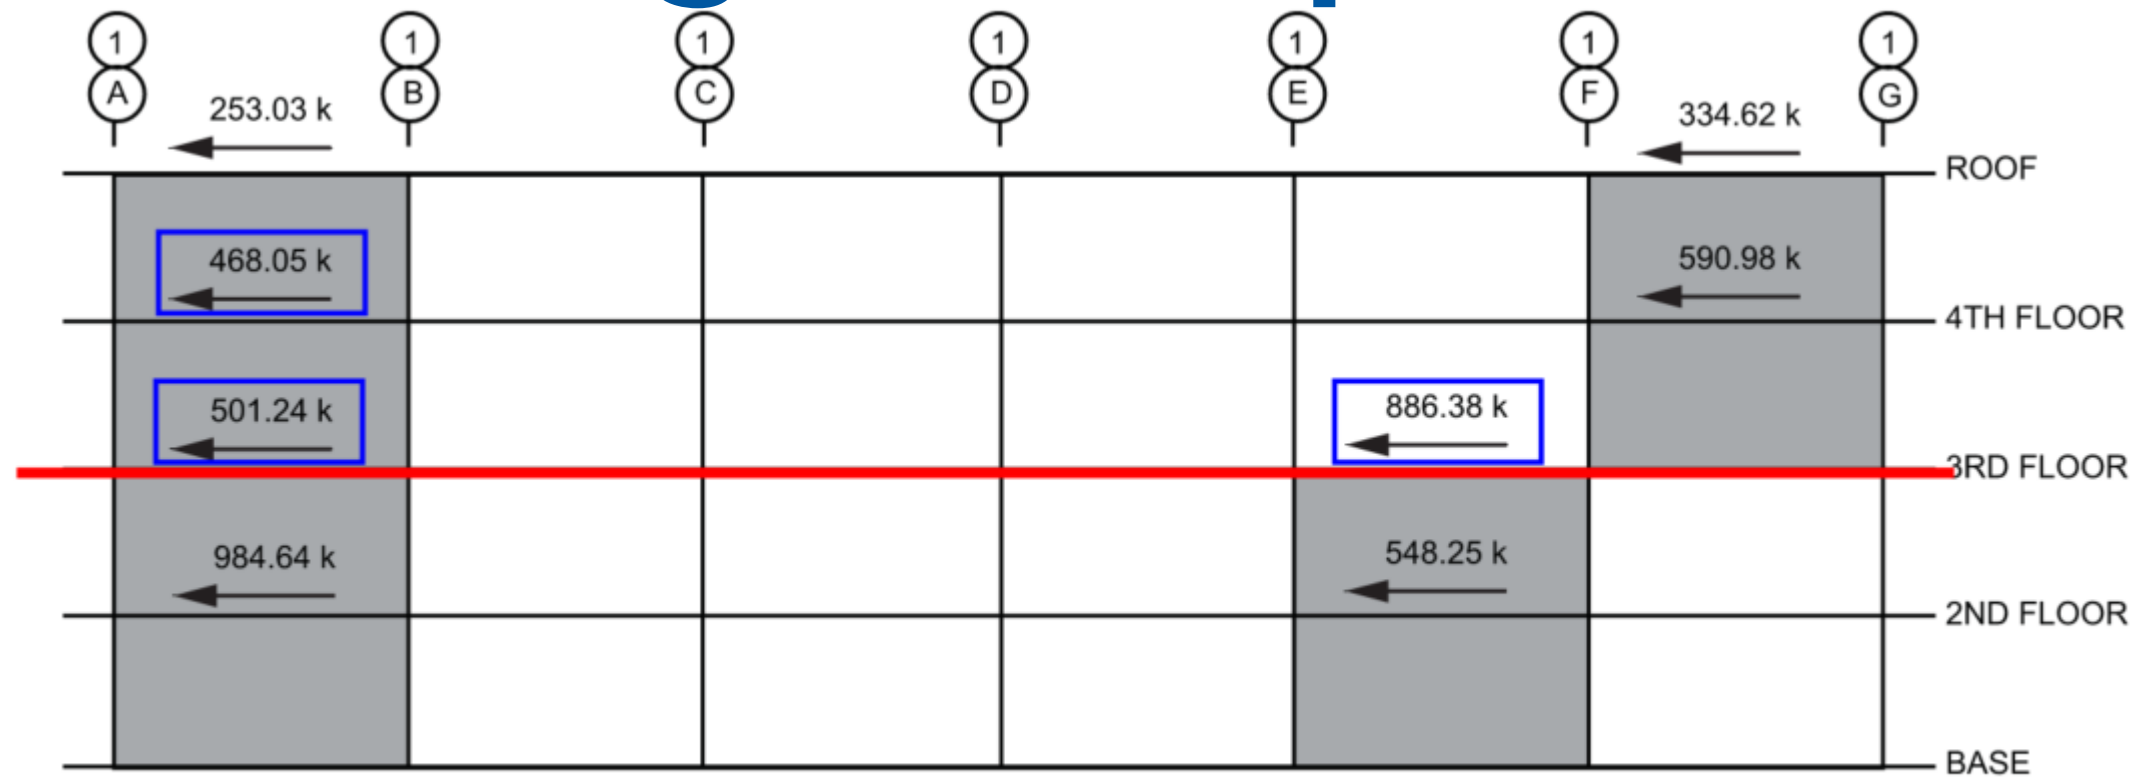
Concrete shear wall forces by level, wall on gridline 1
